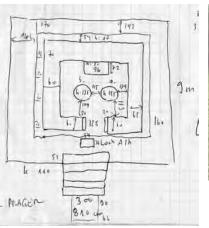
Structure *I*, ground plan. Field sketch by Christian Prager, 1997.
